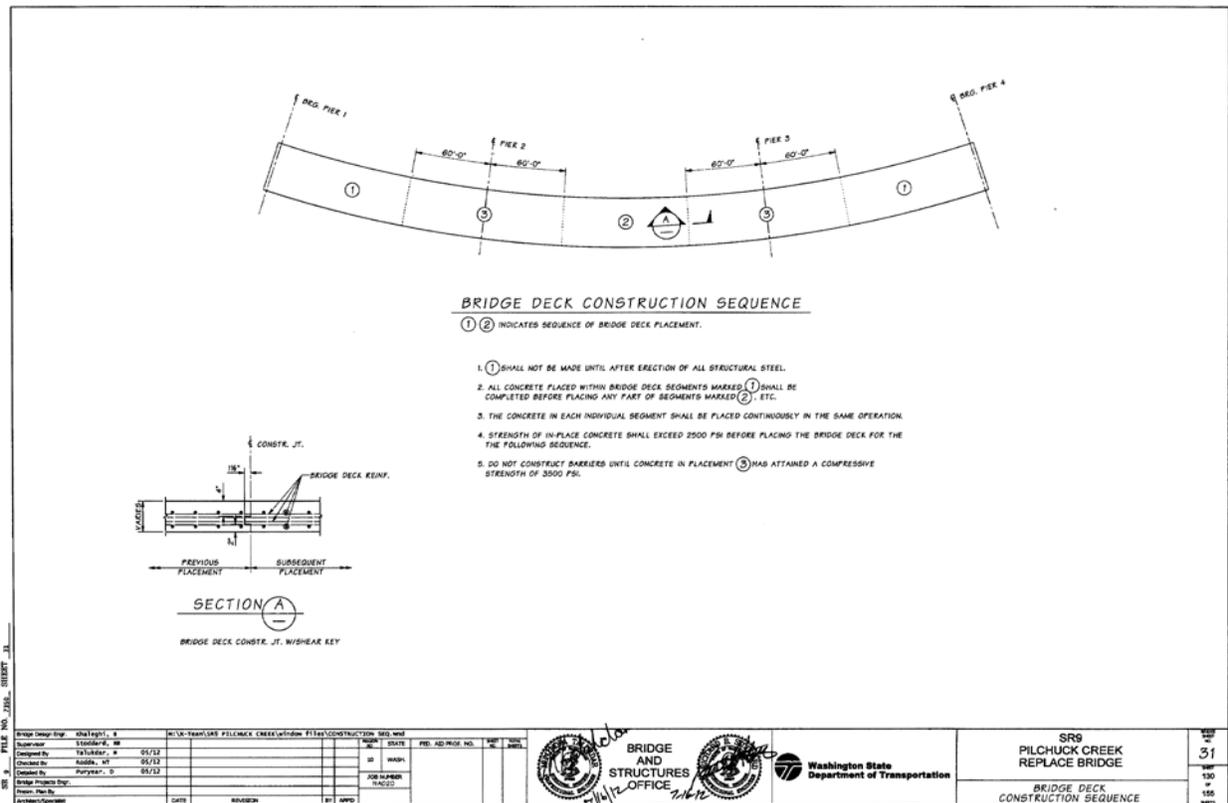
Steel Plate Girder Bridge Deck Construction Joints
